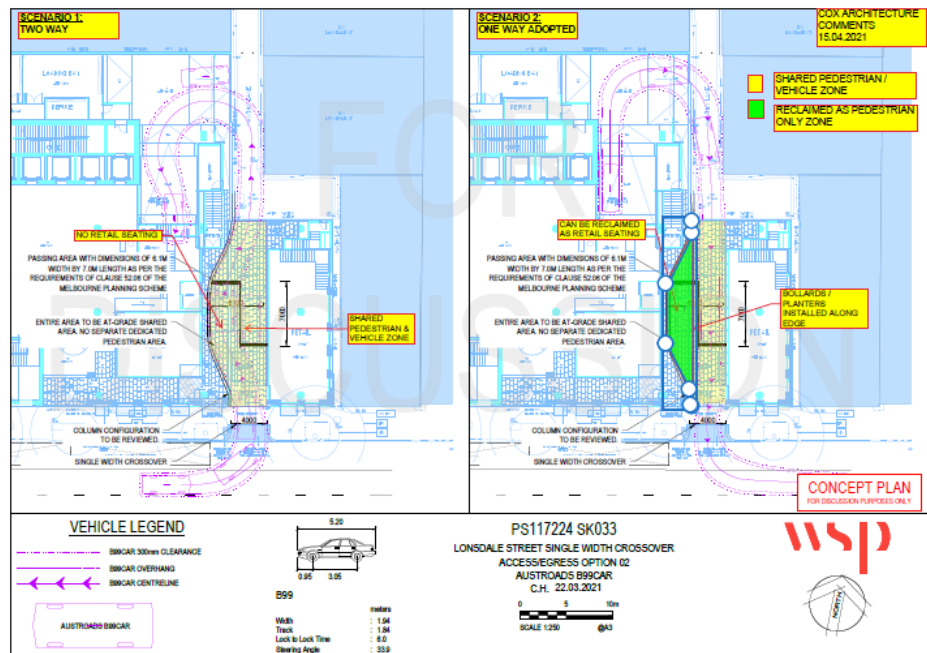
Indicative plans 20 April 2021 (Source: Applicant)
